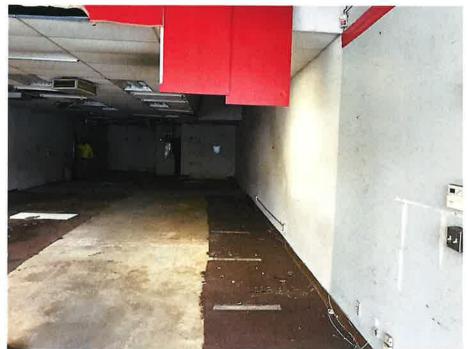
Electrical control panel and floor staining within former O'Reilly Auto Parts store.
